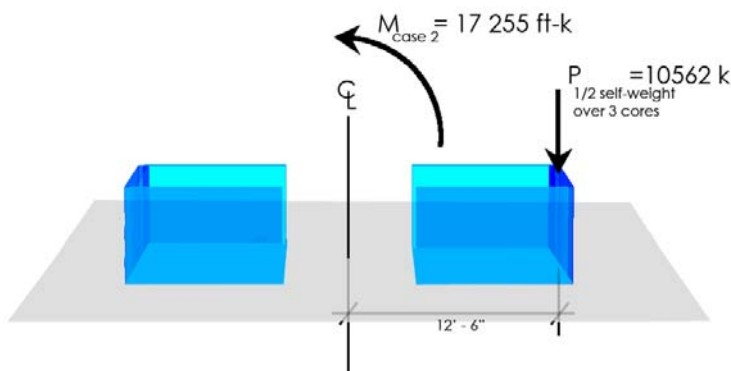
Diagram of loads applied at a section cut of a concrete core.
